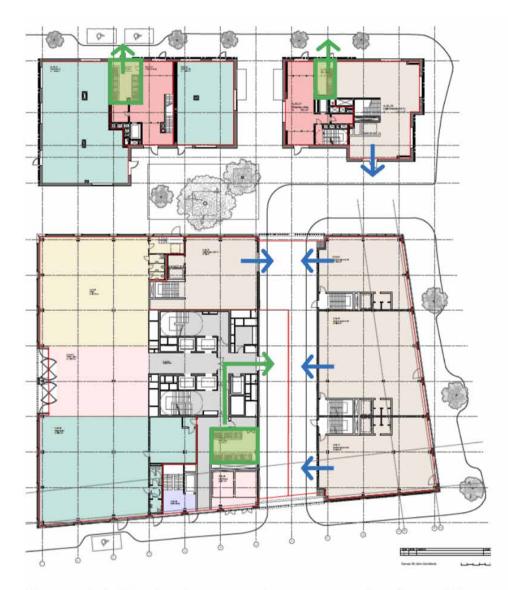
Waste stores and access routes (specific areas highlighted green) Diagram from outline Delivery and Servicing Plan
